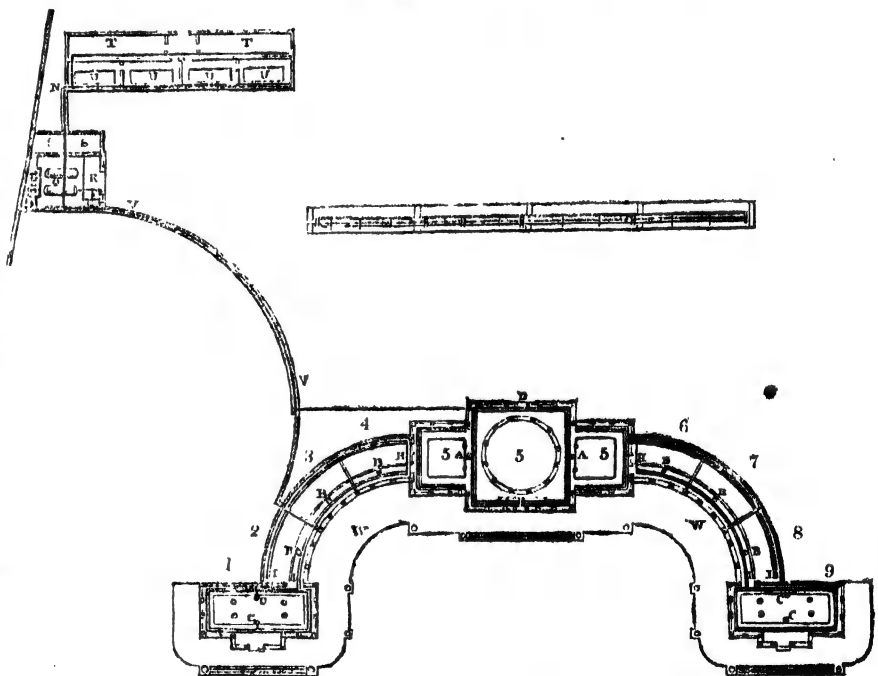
Ground Plan of the Conservatory at Syon House, showing the arrangement of the Steam Boilers, Pipes, &c.
